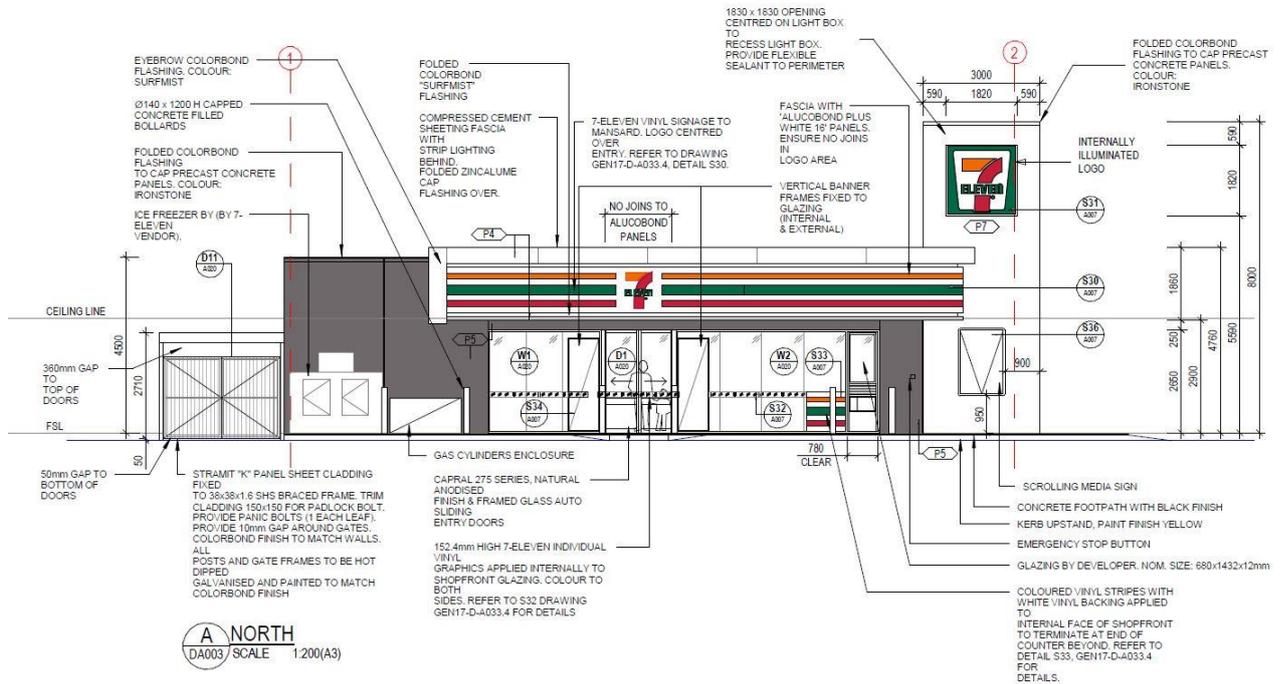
North Elevation (Source: Munns Sly Moore Architects)
